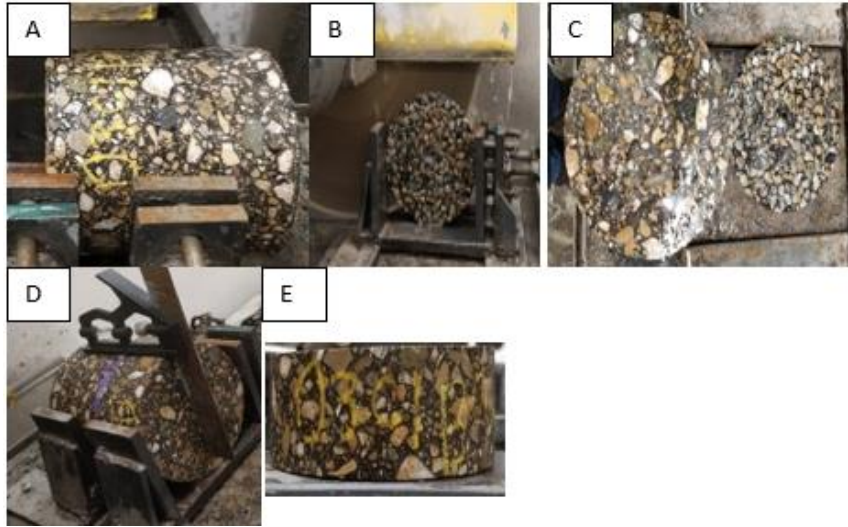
Example of field cores preparation for indirect tensile test; a) securing the specimen in a sample holder, b) trimming seal coat layer, c) excluded seal coat layer, d) cutting the surface layer, e) IDT test specimen
